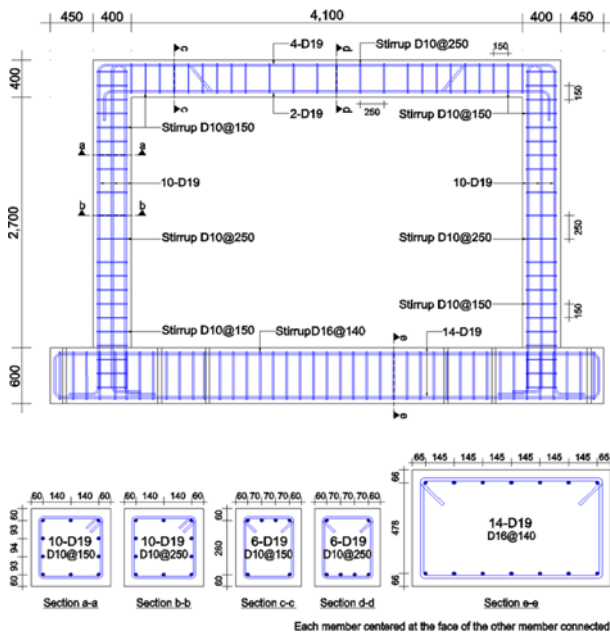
Dimensions and Reinforcement of the RC Frame for Specimen PR1 (mm)
